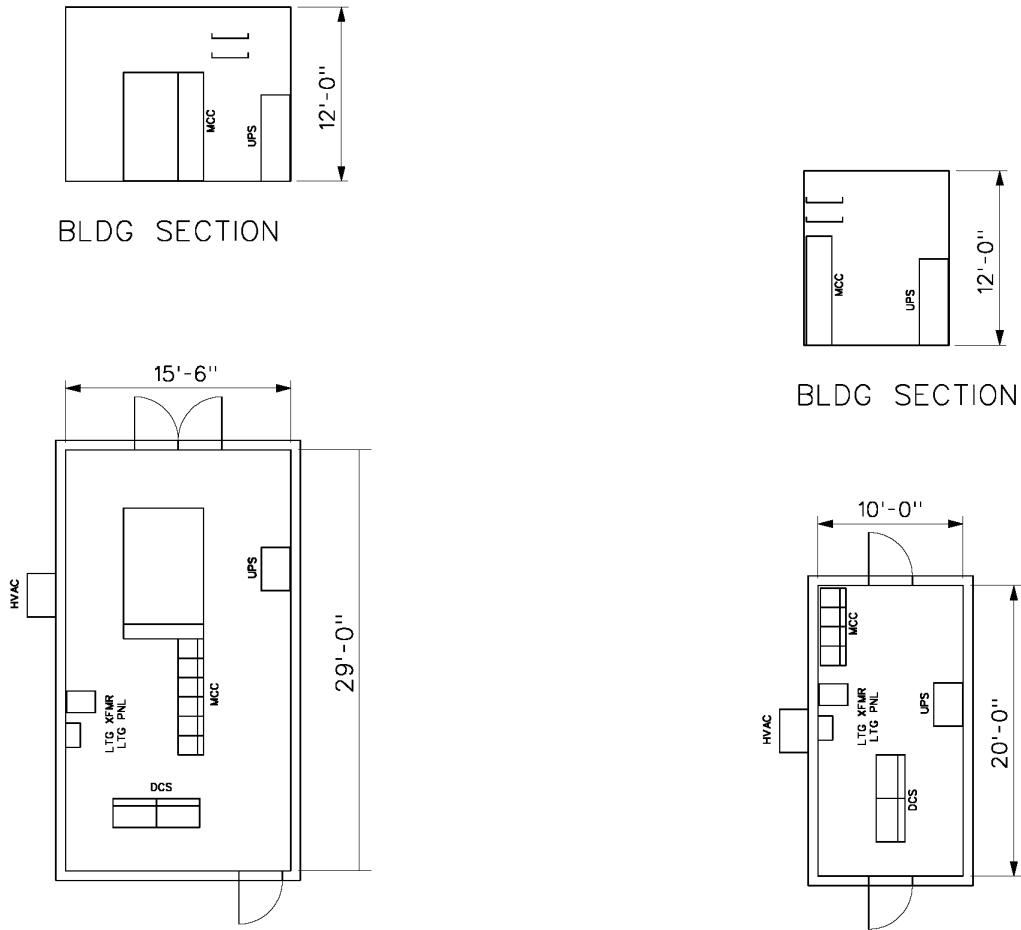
Passive Draft Dry/Air Cooling—Main Switchgear Electrical Building
